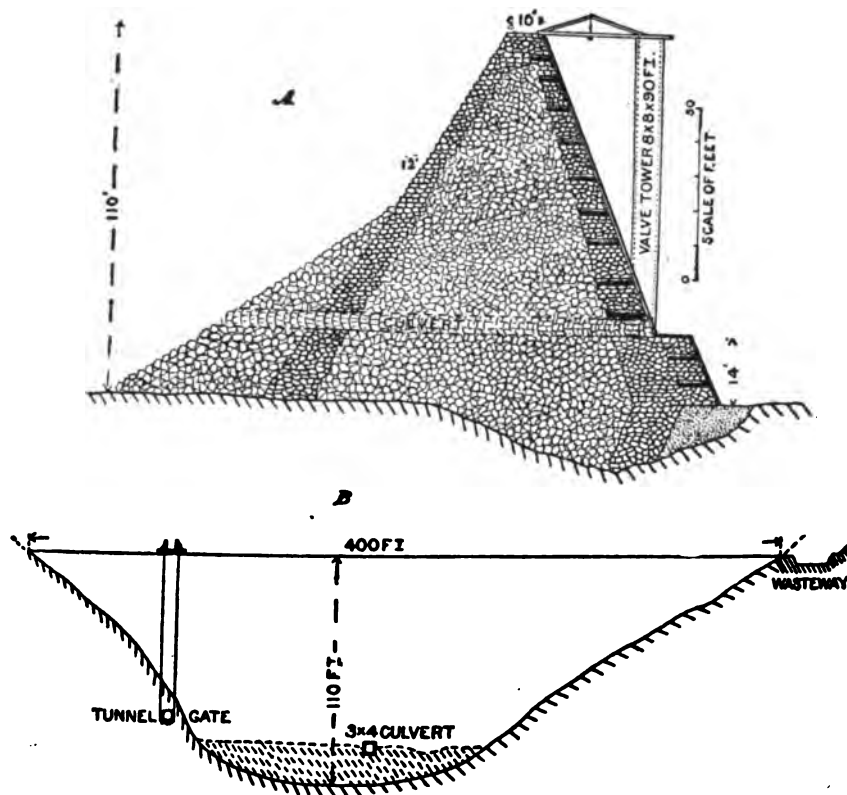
CROSS-SECTION AND ELEVATION OF WALNUT GROVE DAM, ARIZONA.
